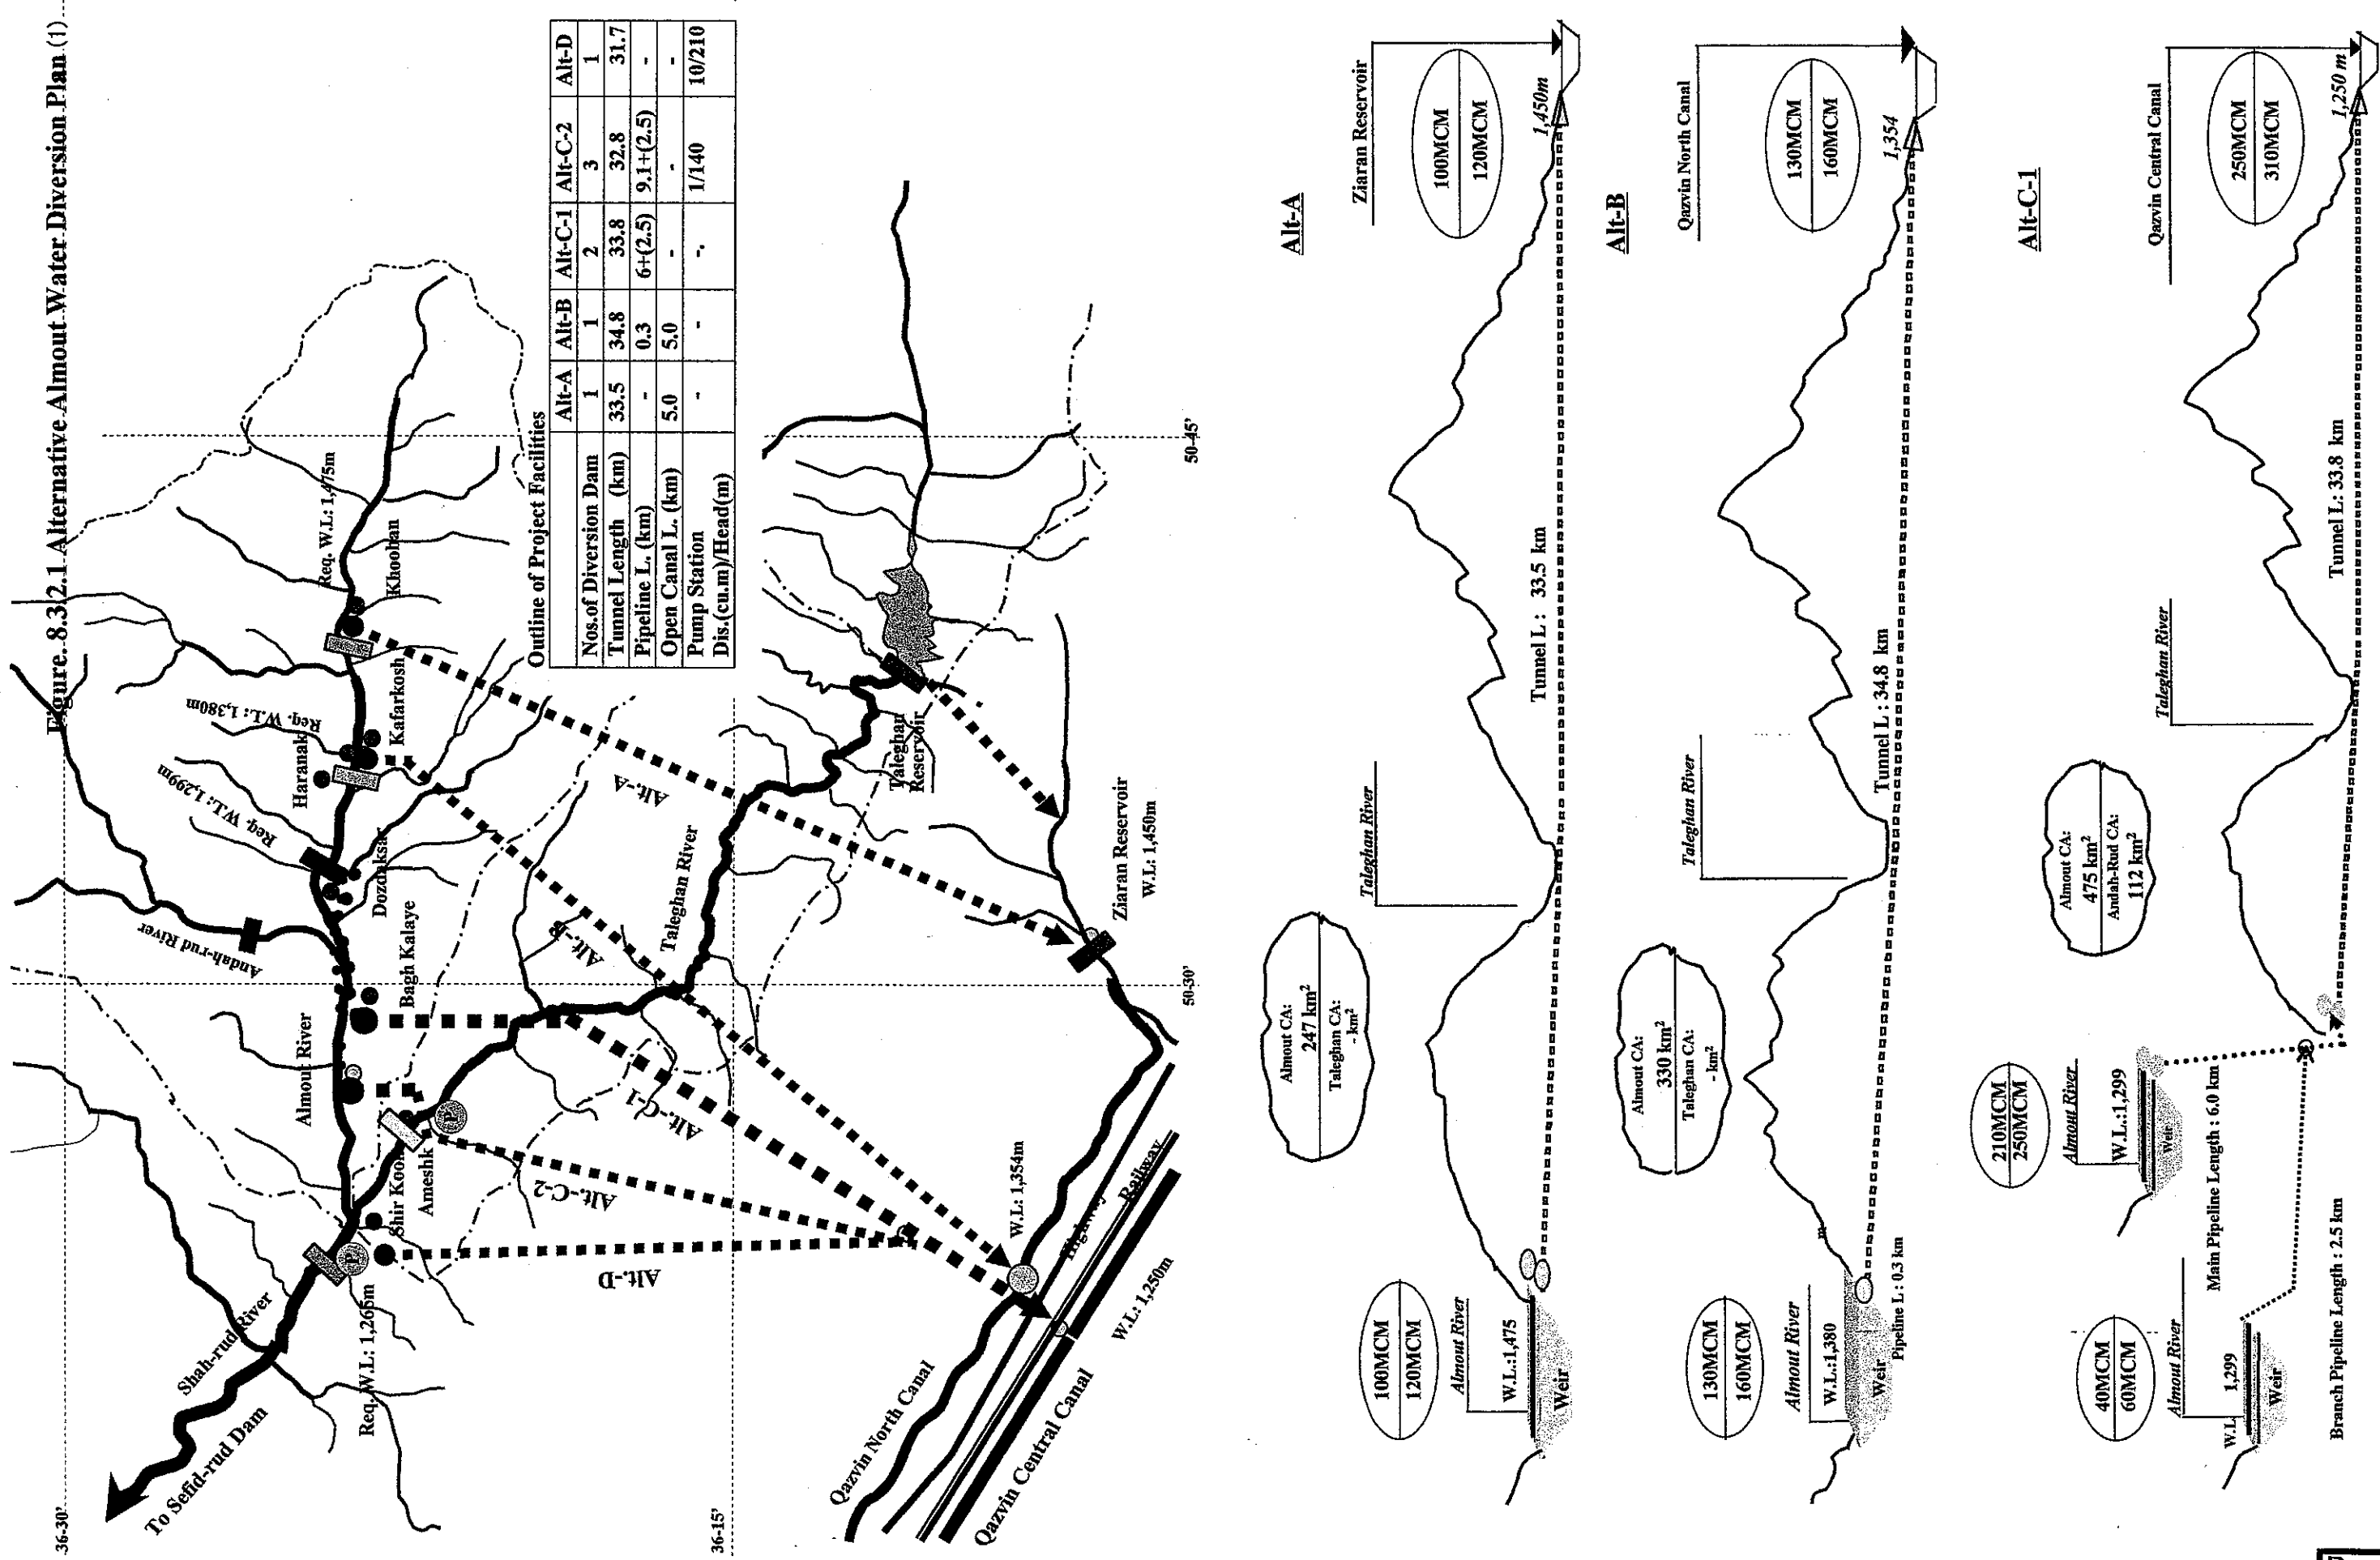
Alternative Almut Water Diversion Plan (1)
